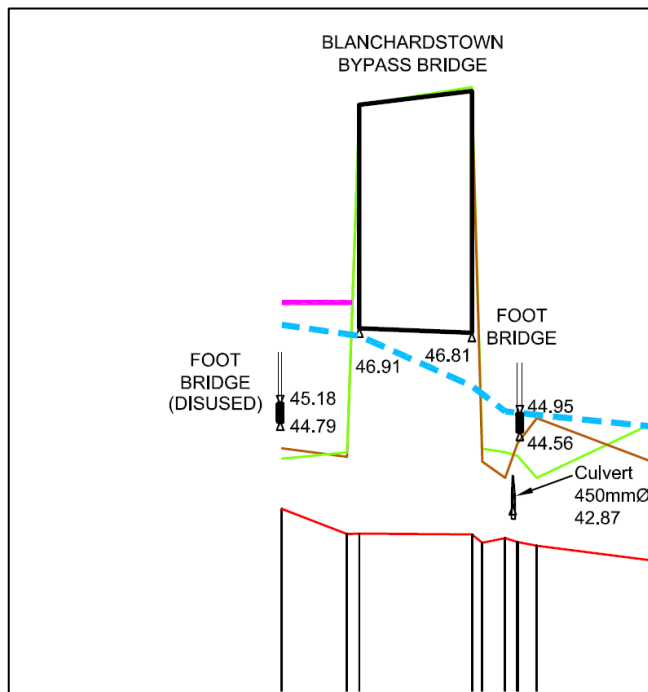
Blanchardstown Bypass Bridge No. 1 1 in-100-year hydraulic grade line (extract from the River Tolka Flooding Study Final Report)
